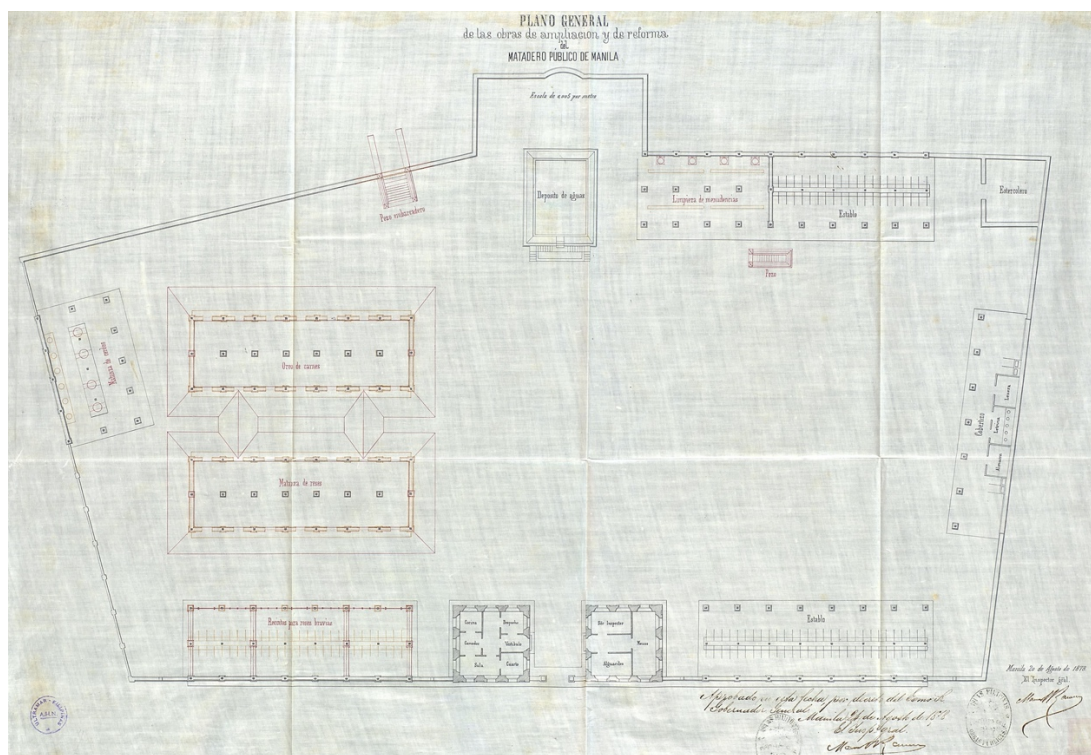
The plan for the new slaughterhouse of Manila in Arroceros
